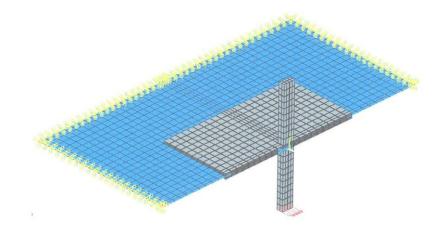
Cross section of finite element model of an interior slab-column joint of flat-plate
